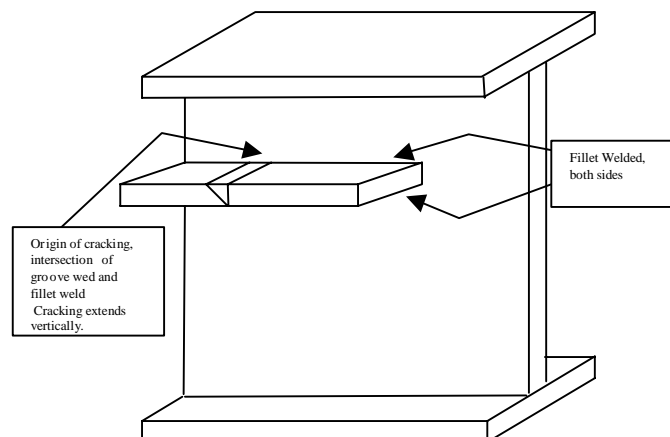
Cracking Mechanism in Longitudinal Web Stiffeners
